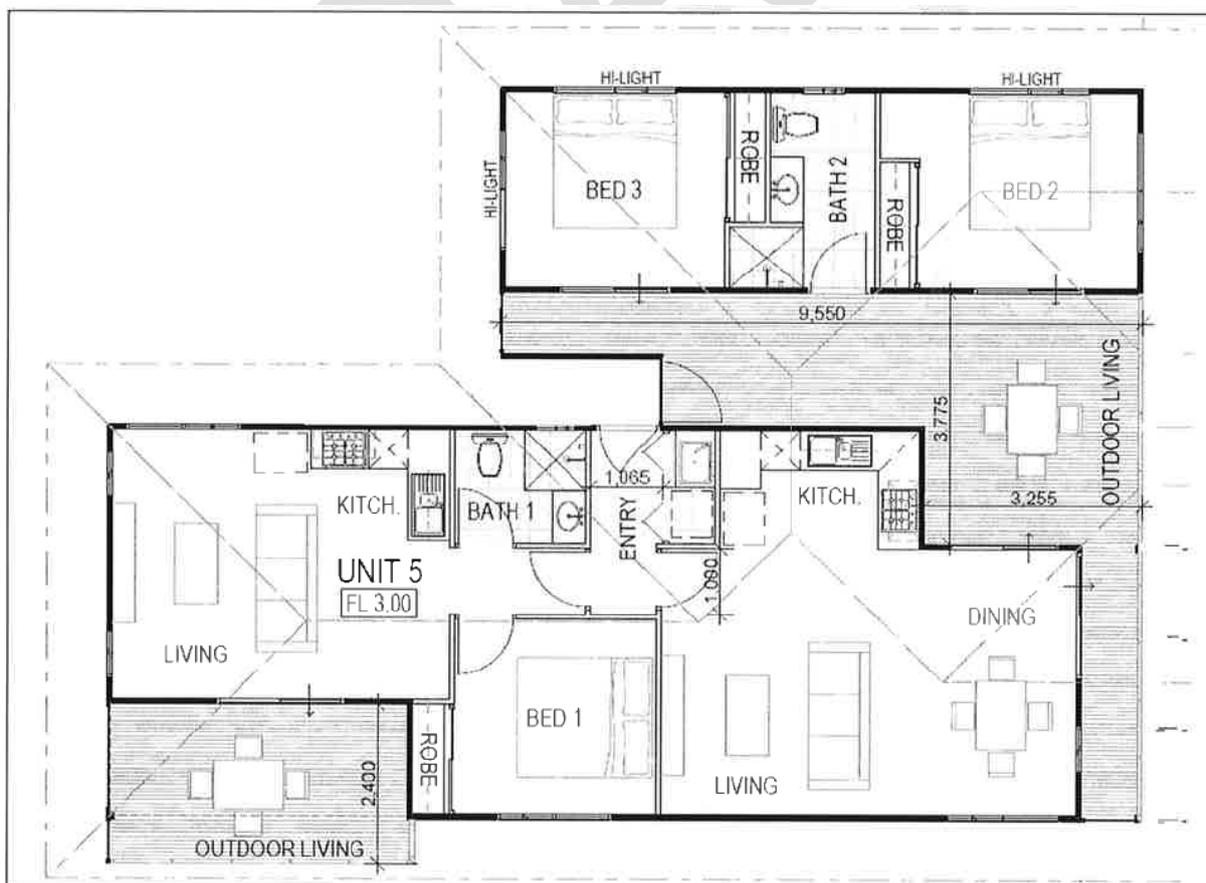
An example of a layout which has common laundry facilities but the form and function is two separate dwelling units. This would be classed as two multiple dwellings, grouped dwellings or single house with ancillary dwelling.
